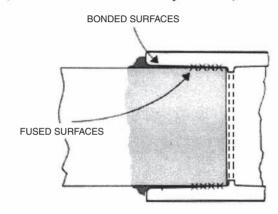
D: Completed solvent cement joint. Note bonded and fused surfaces. Courtesy NIBCO, Inc.
